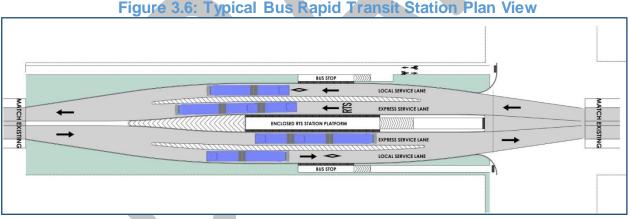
Typical Bus Rapid Transit Station Plan View
